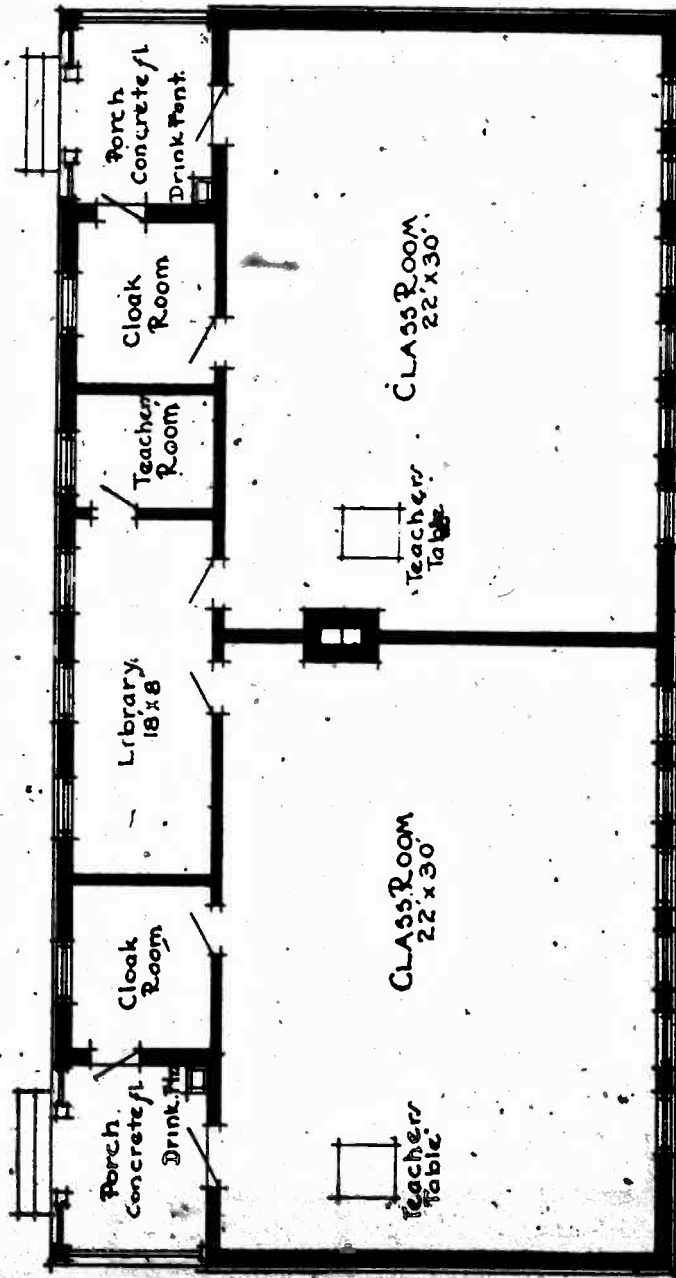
Floor plan, Model No. 4. Two-teacher school.
